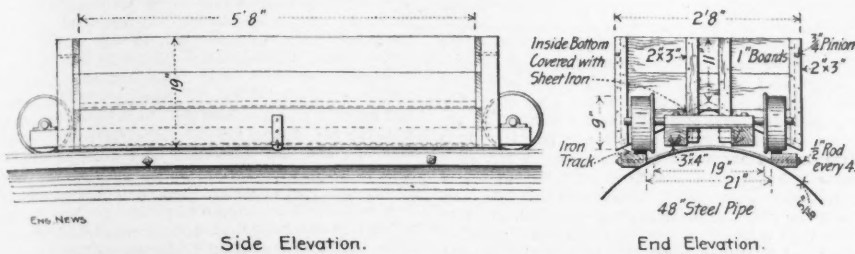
CAR USED IN DEPOSITING CONCRETE AROUND THE 48-IN. STEEL PIPE IN TUNNEL.
